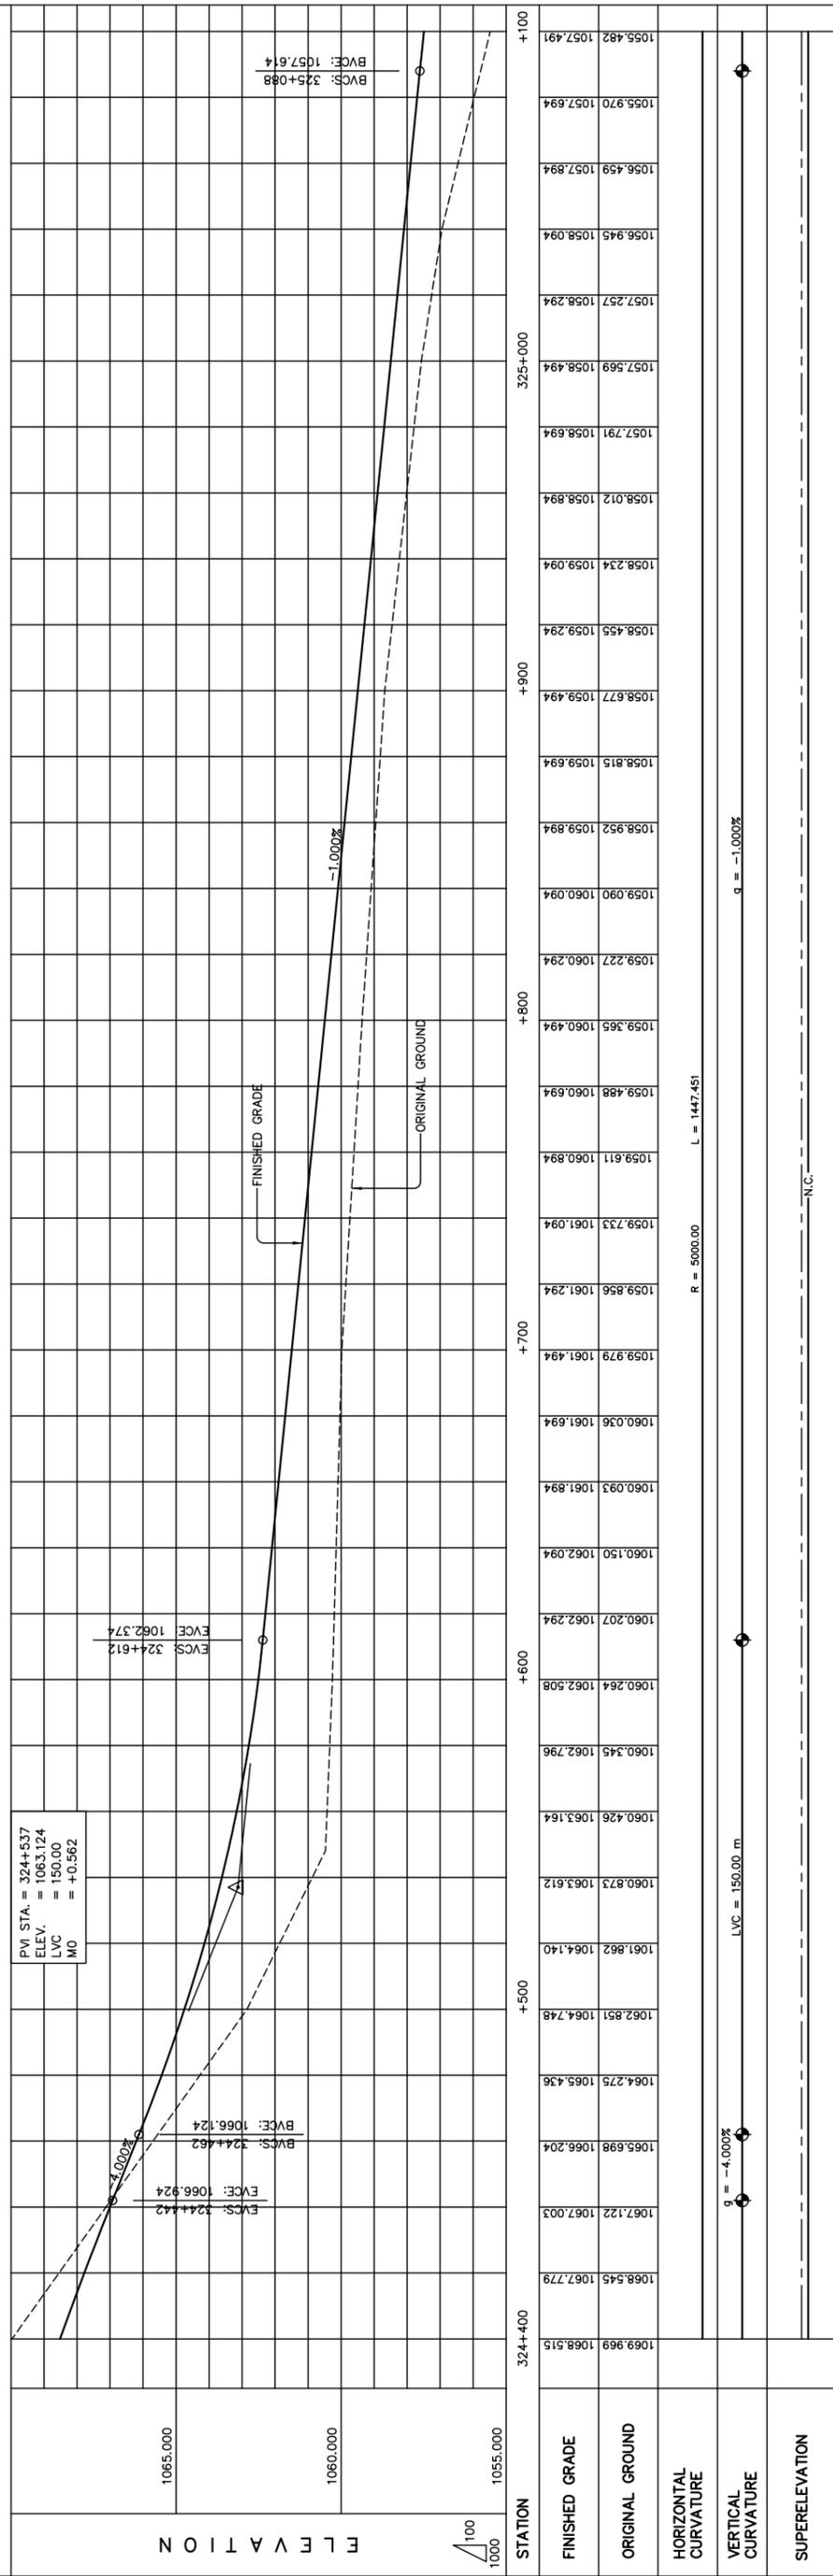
Plan and Profile (Section VI Sta.323+700-Sta.324+400)
